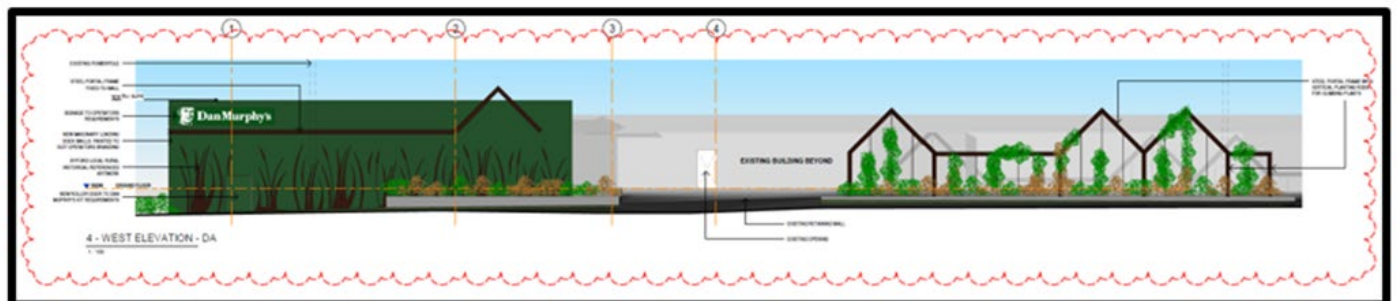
George Street (West) frontage showing the screening frame to the right and new loading dock to the left
